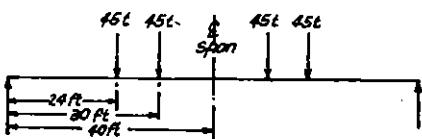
Longitudinal disposition of loading vehicle on beam and slab bridge
